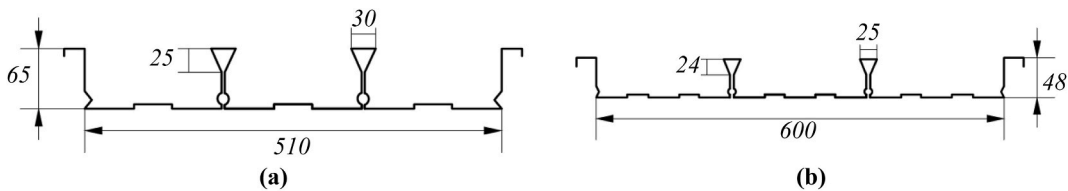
Details of the profiled steel decks (dimensions in mm).
